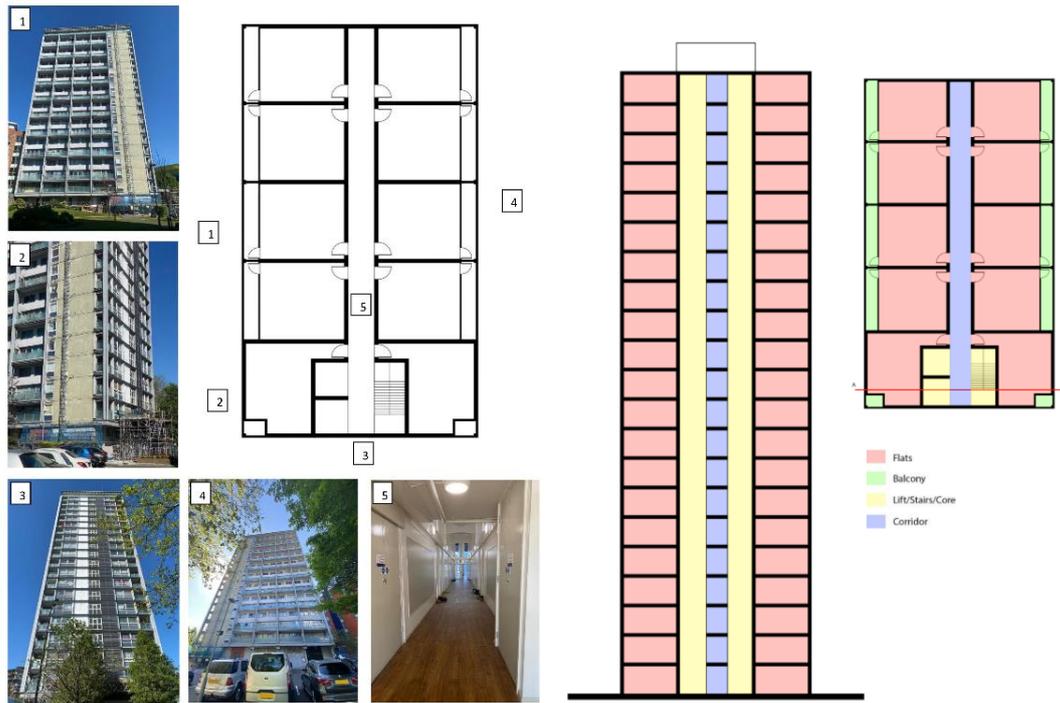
The case study building “Polesworth house”; an approximate section and plan.
